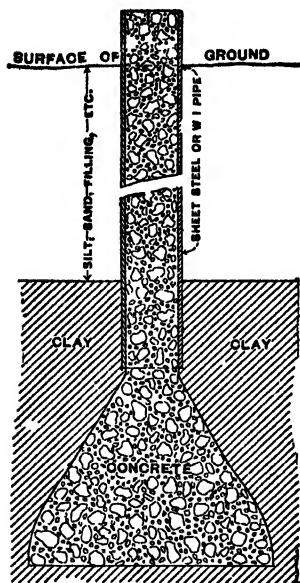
Concrete Pile with Enlarged Footing. (See p. 651.)
